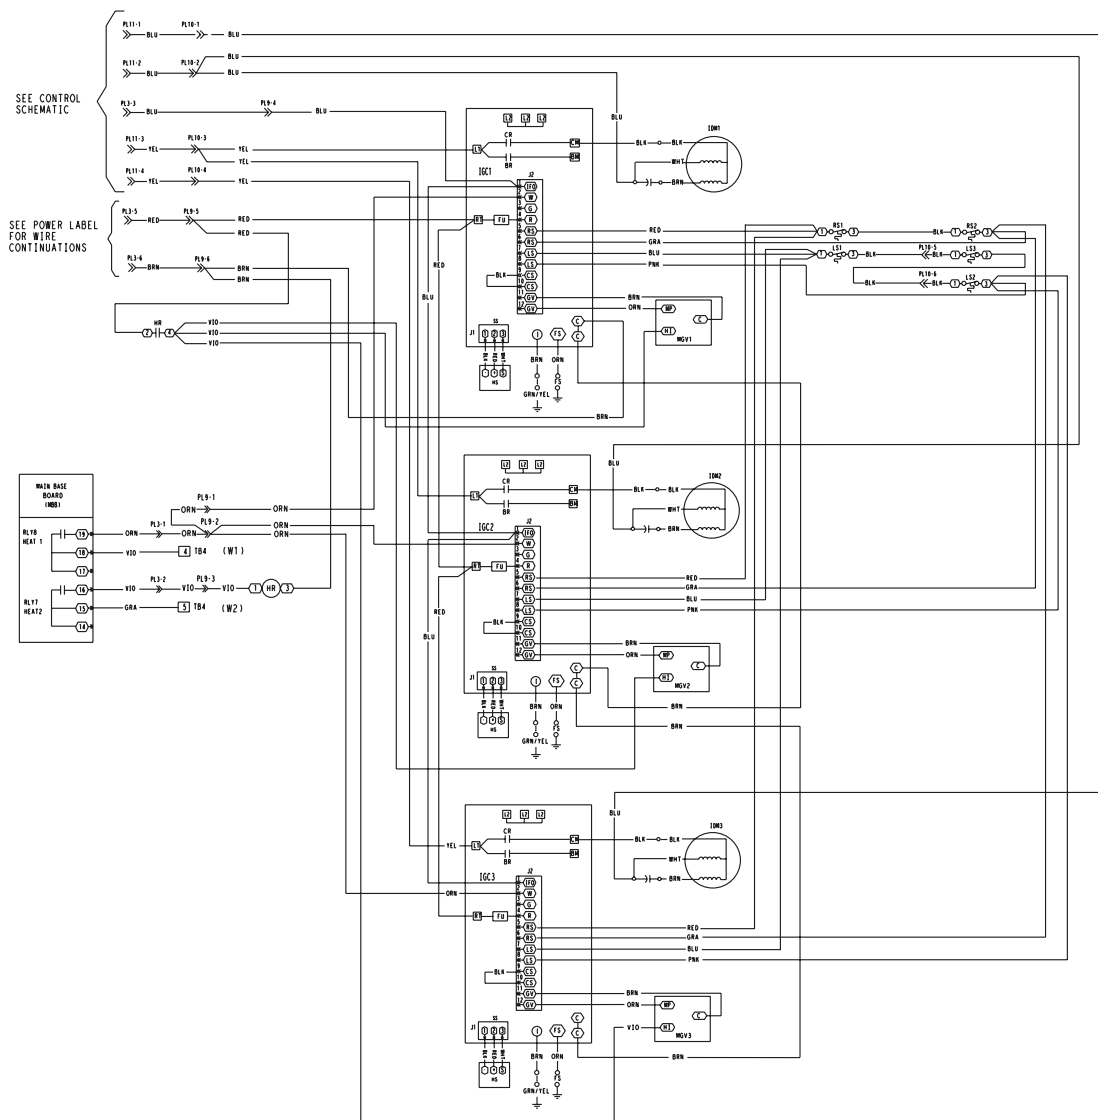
Typical 2 Stage Gas Heat Wiring Schematic (Size 060 Units Shown)
